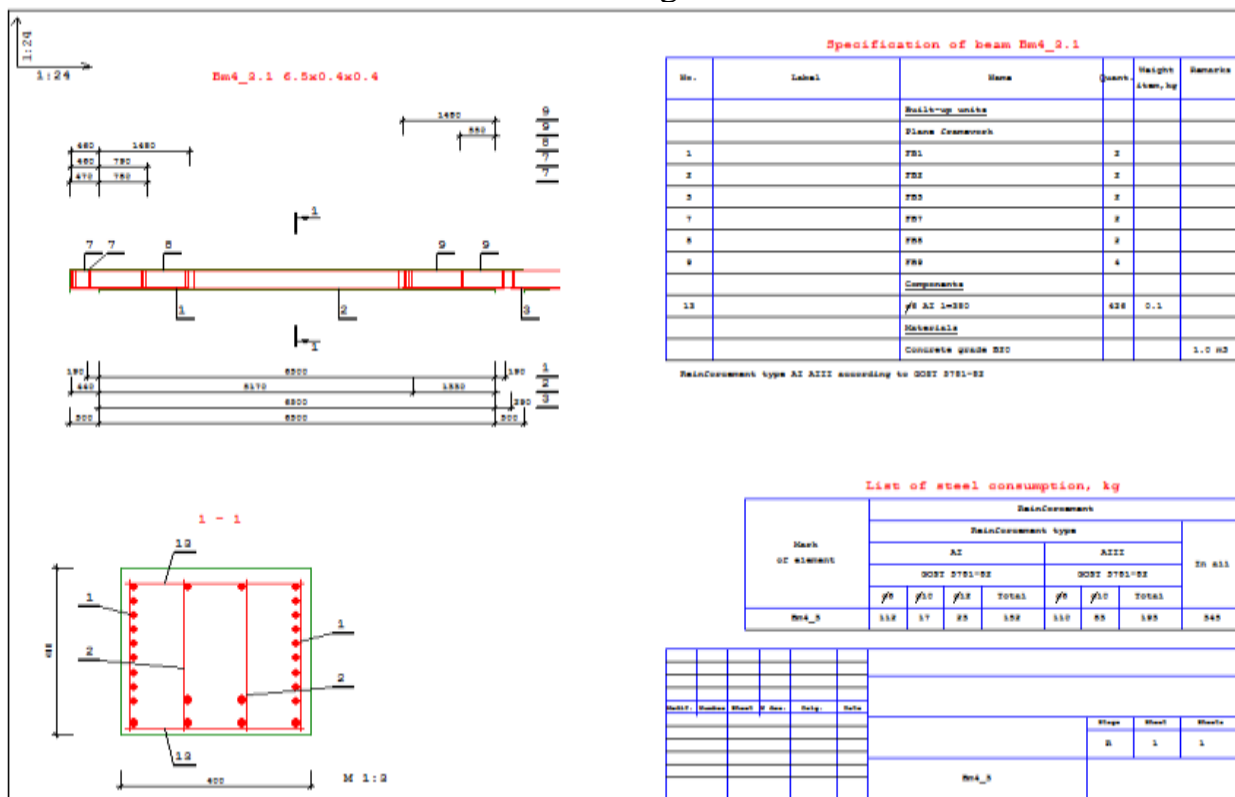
Variant of a building with a beam - slab floor. Beam B4-3. Working project drawings
